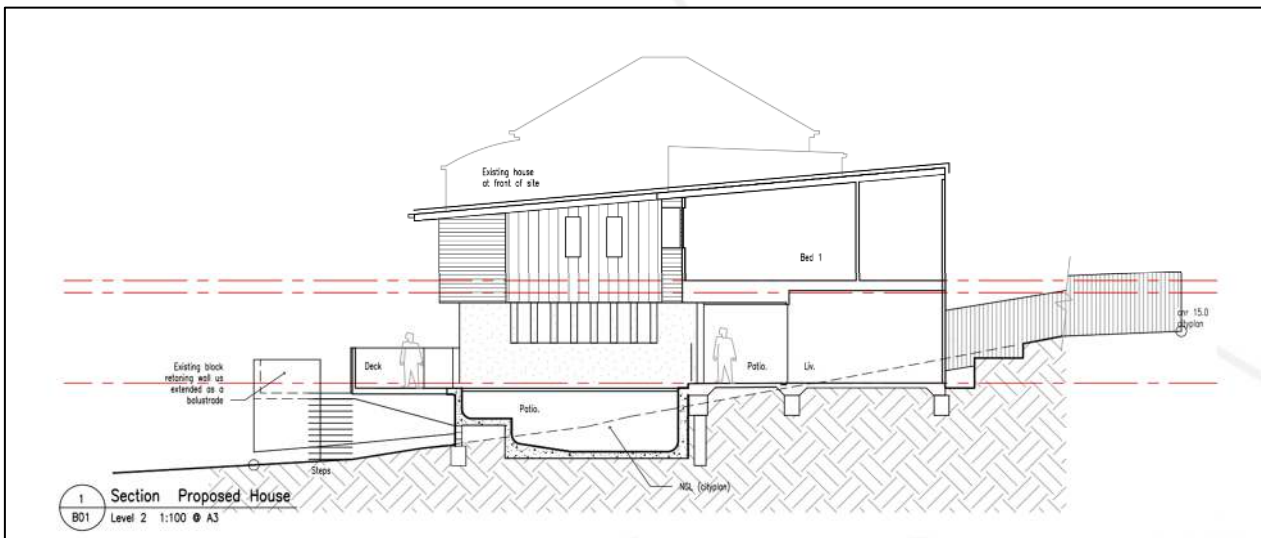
Proposed plans (Source: Source: Price Musgrave Architecture)
